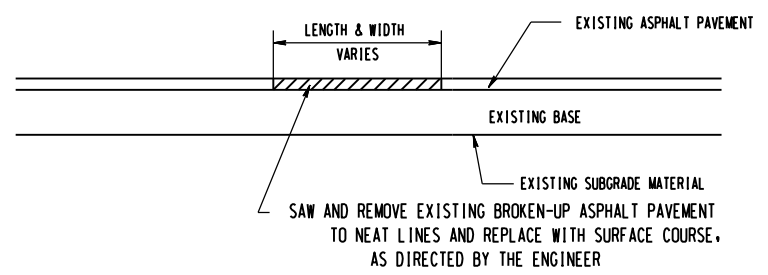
DETAILS OF PATCHING EXISTING PAVEMENT PRIOR TO RESURFACING FOR FULL DEPTH AND MILLING
